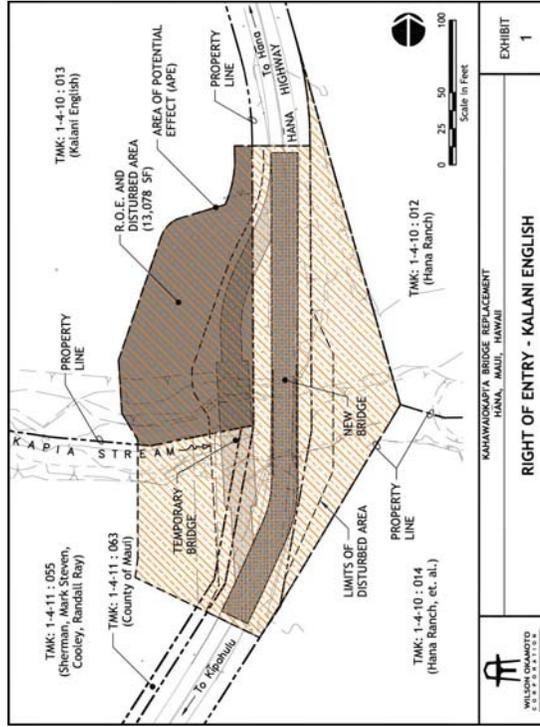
Detail plans of proposed bridge replacement (courtesy of Wilson Okamoto). Area archaeologically surveyed in orange.
